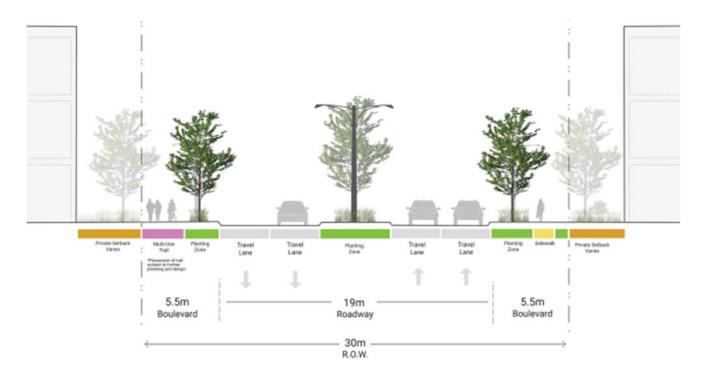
Proposed CWEP Energy Drive Cross-Section (30 metres)
